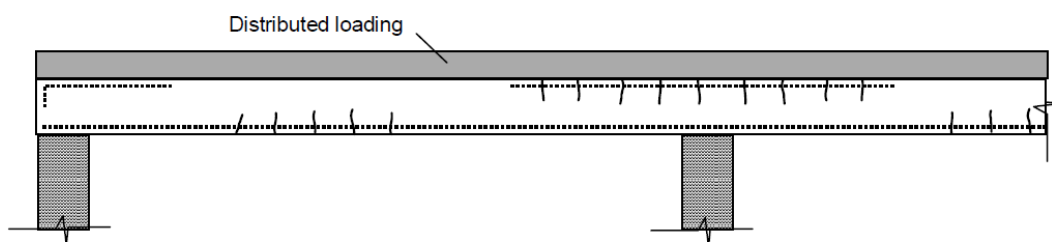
Typical flexural cracks in a continuous one-way slab due to gravity loading
